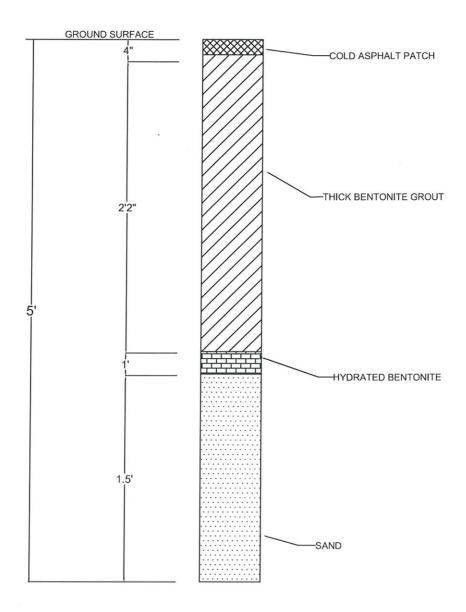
SOIL VAPOR POINT CONSTRUCTION DETAIL
